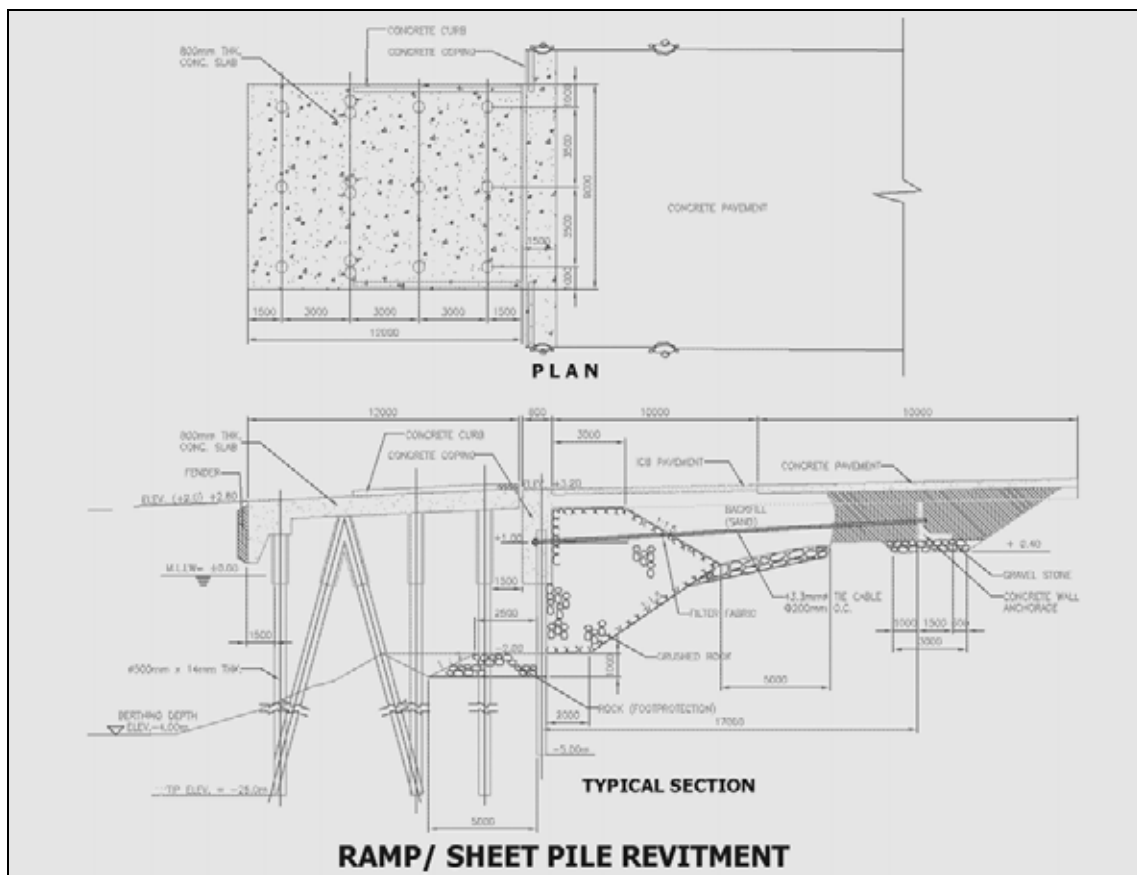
Plan and Typical Section of Ramp/Sheet Pile Revitment
